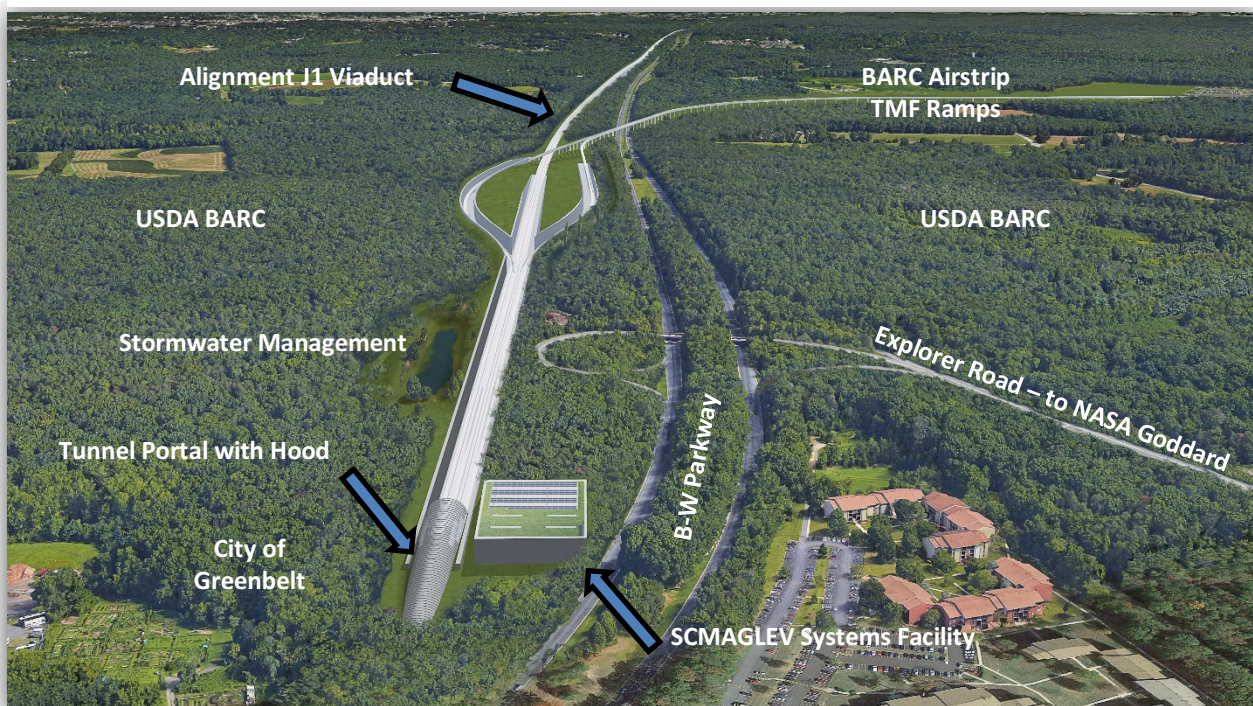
CAAs #5, #6, #7, #8, #9 AFTER: Illustrative Rendering of Alignment J1 Tunnel Portal at Explorer Road Interchange with Ramps to BARC Airstrip TMF, Looking North
